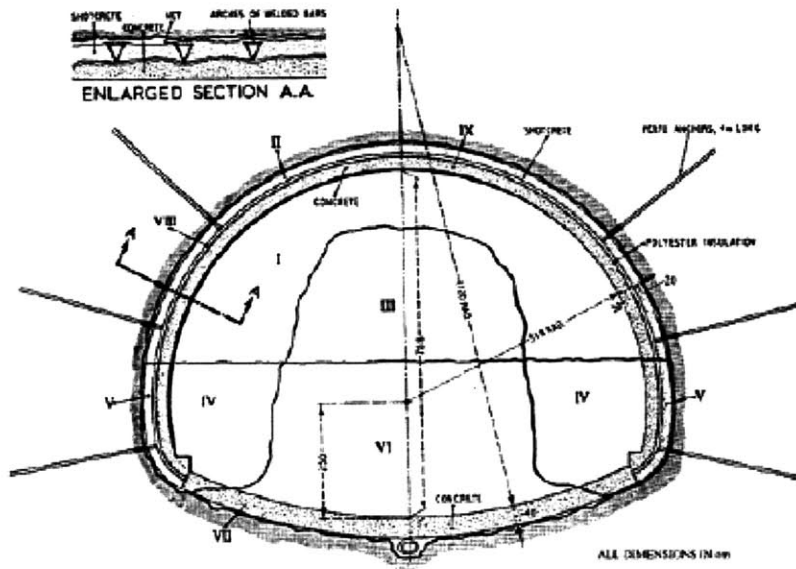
Typical cross section proposed by Rabecewicz (1965)
